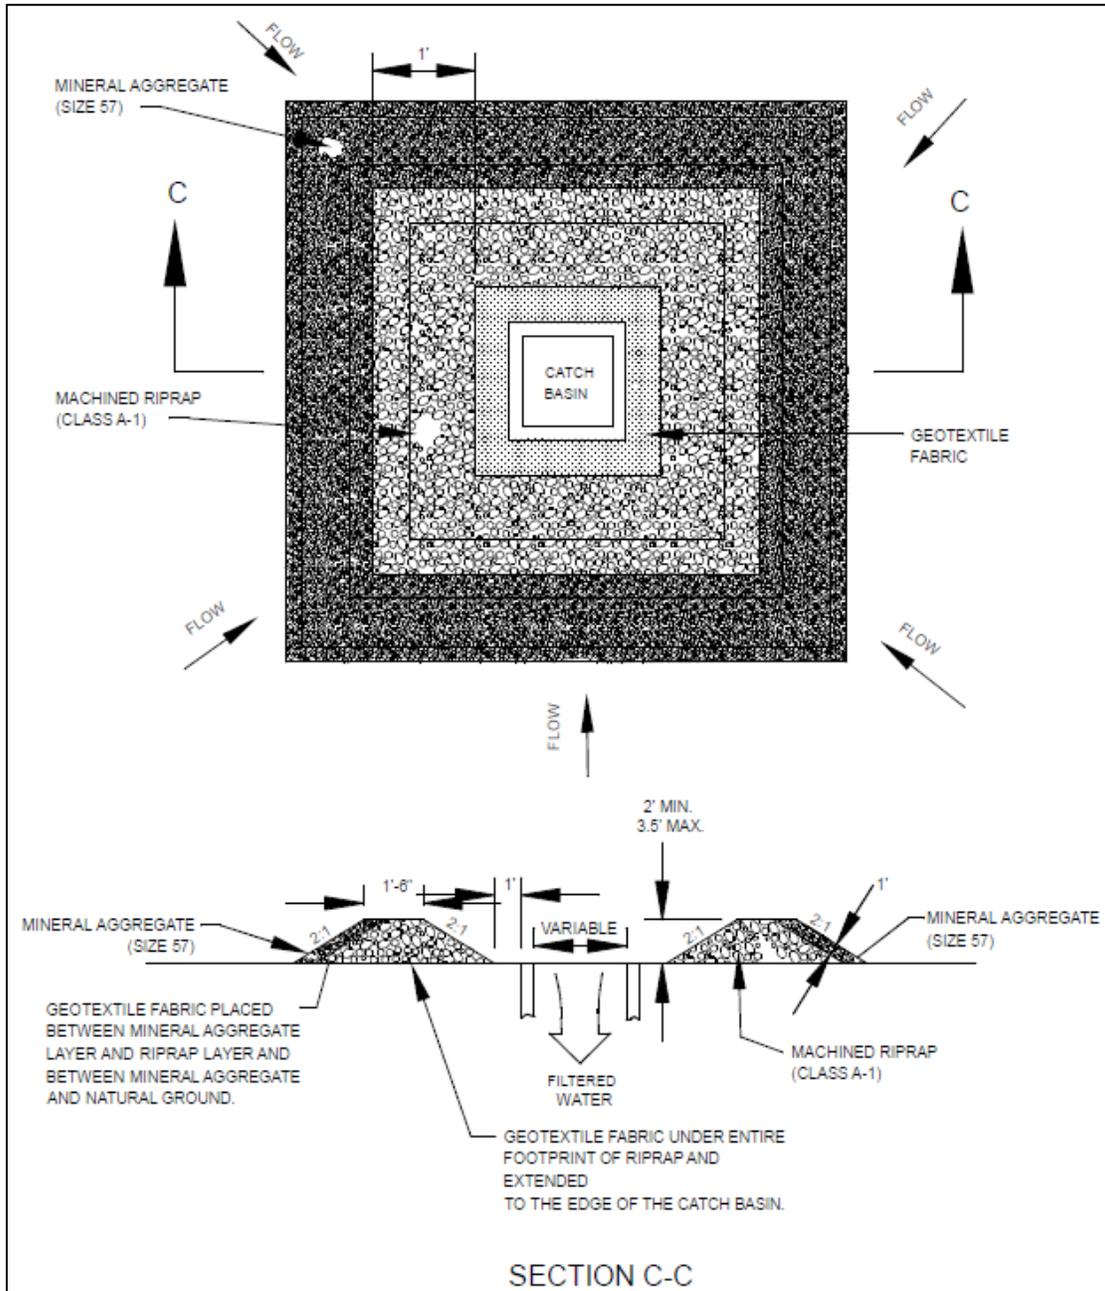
D: Rock ring inlet protection details. Source: TDOT.
